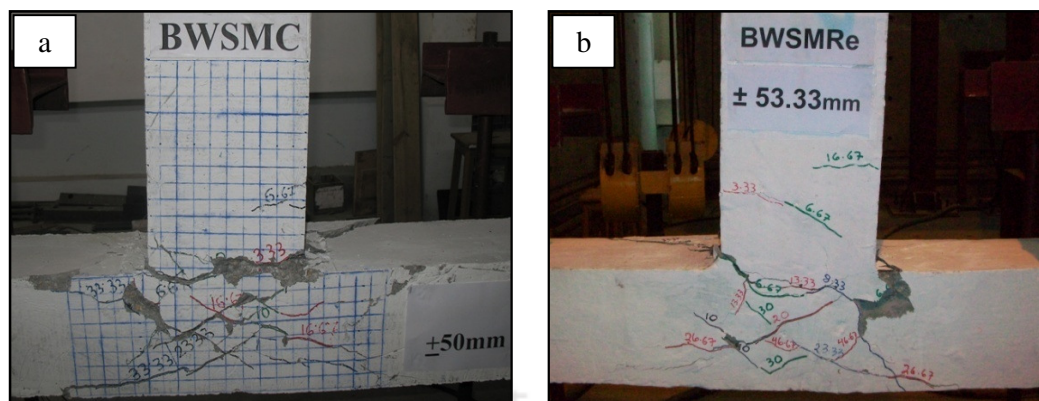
BWSM specimens at the end of test under loading type-1:
